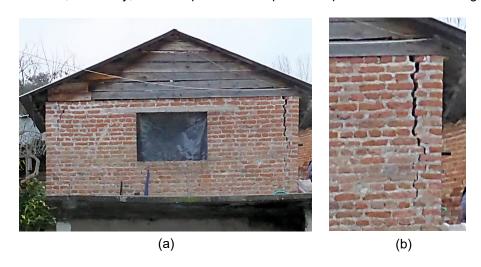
URM building damaged due to out-of-plane failure mechanism in the Bubq village: (a) a view of the gable wall showing vertical cracks at both ends and (b) a detail of the vertical crack at the right end of the wall (photos: SUZI-SAEE).
